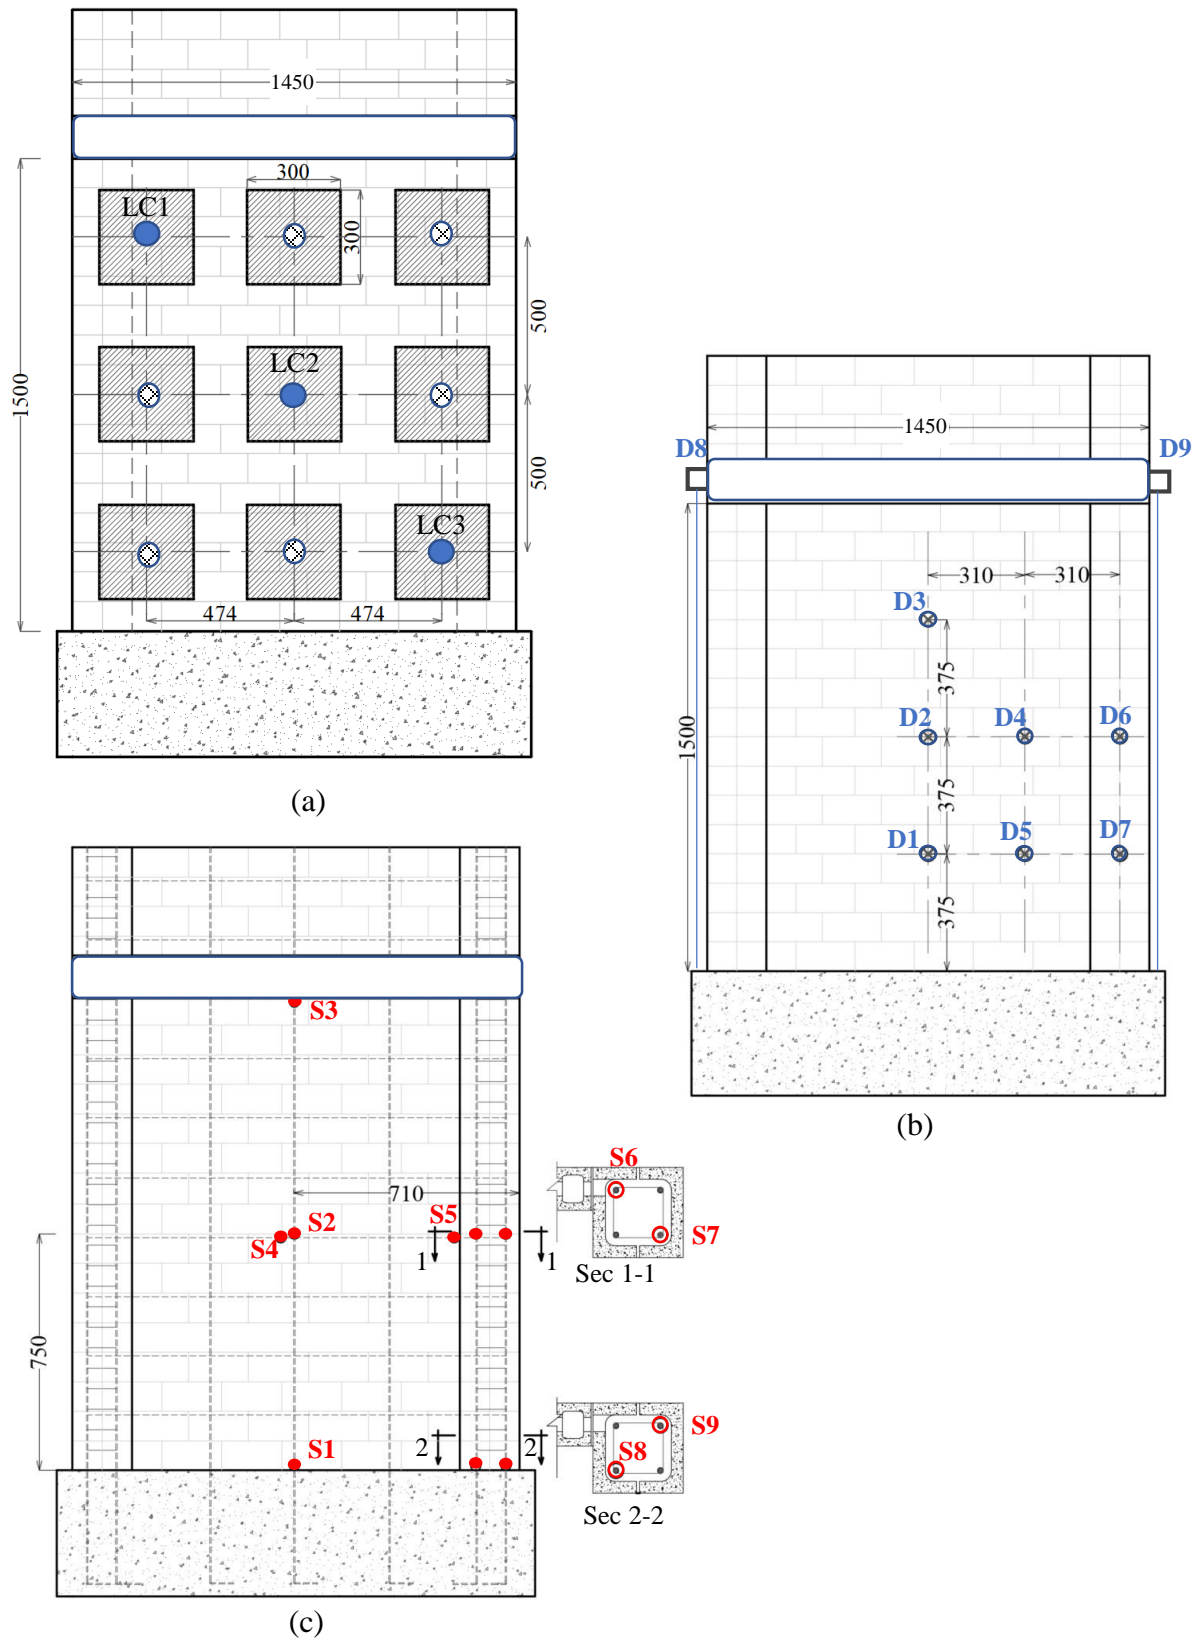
Typical wall instrumentations (All dimensions are in mm):
